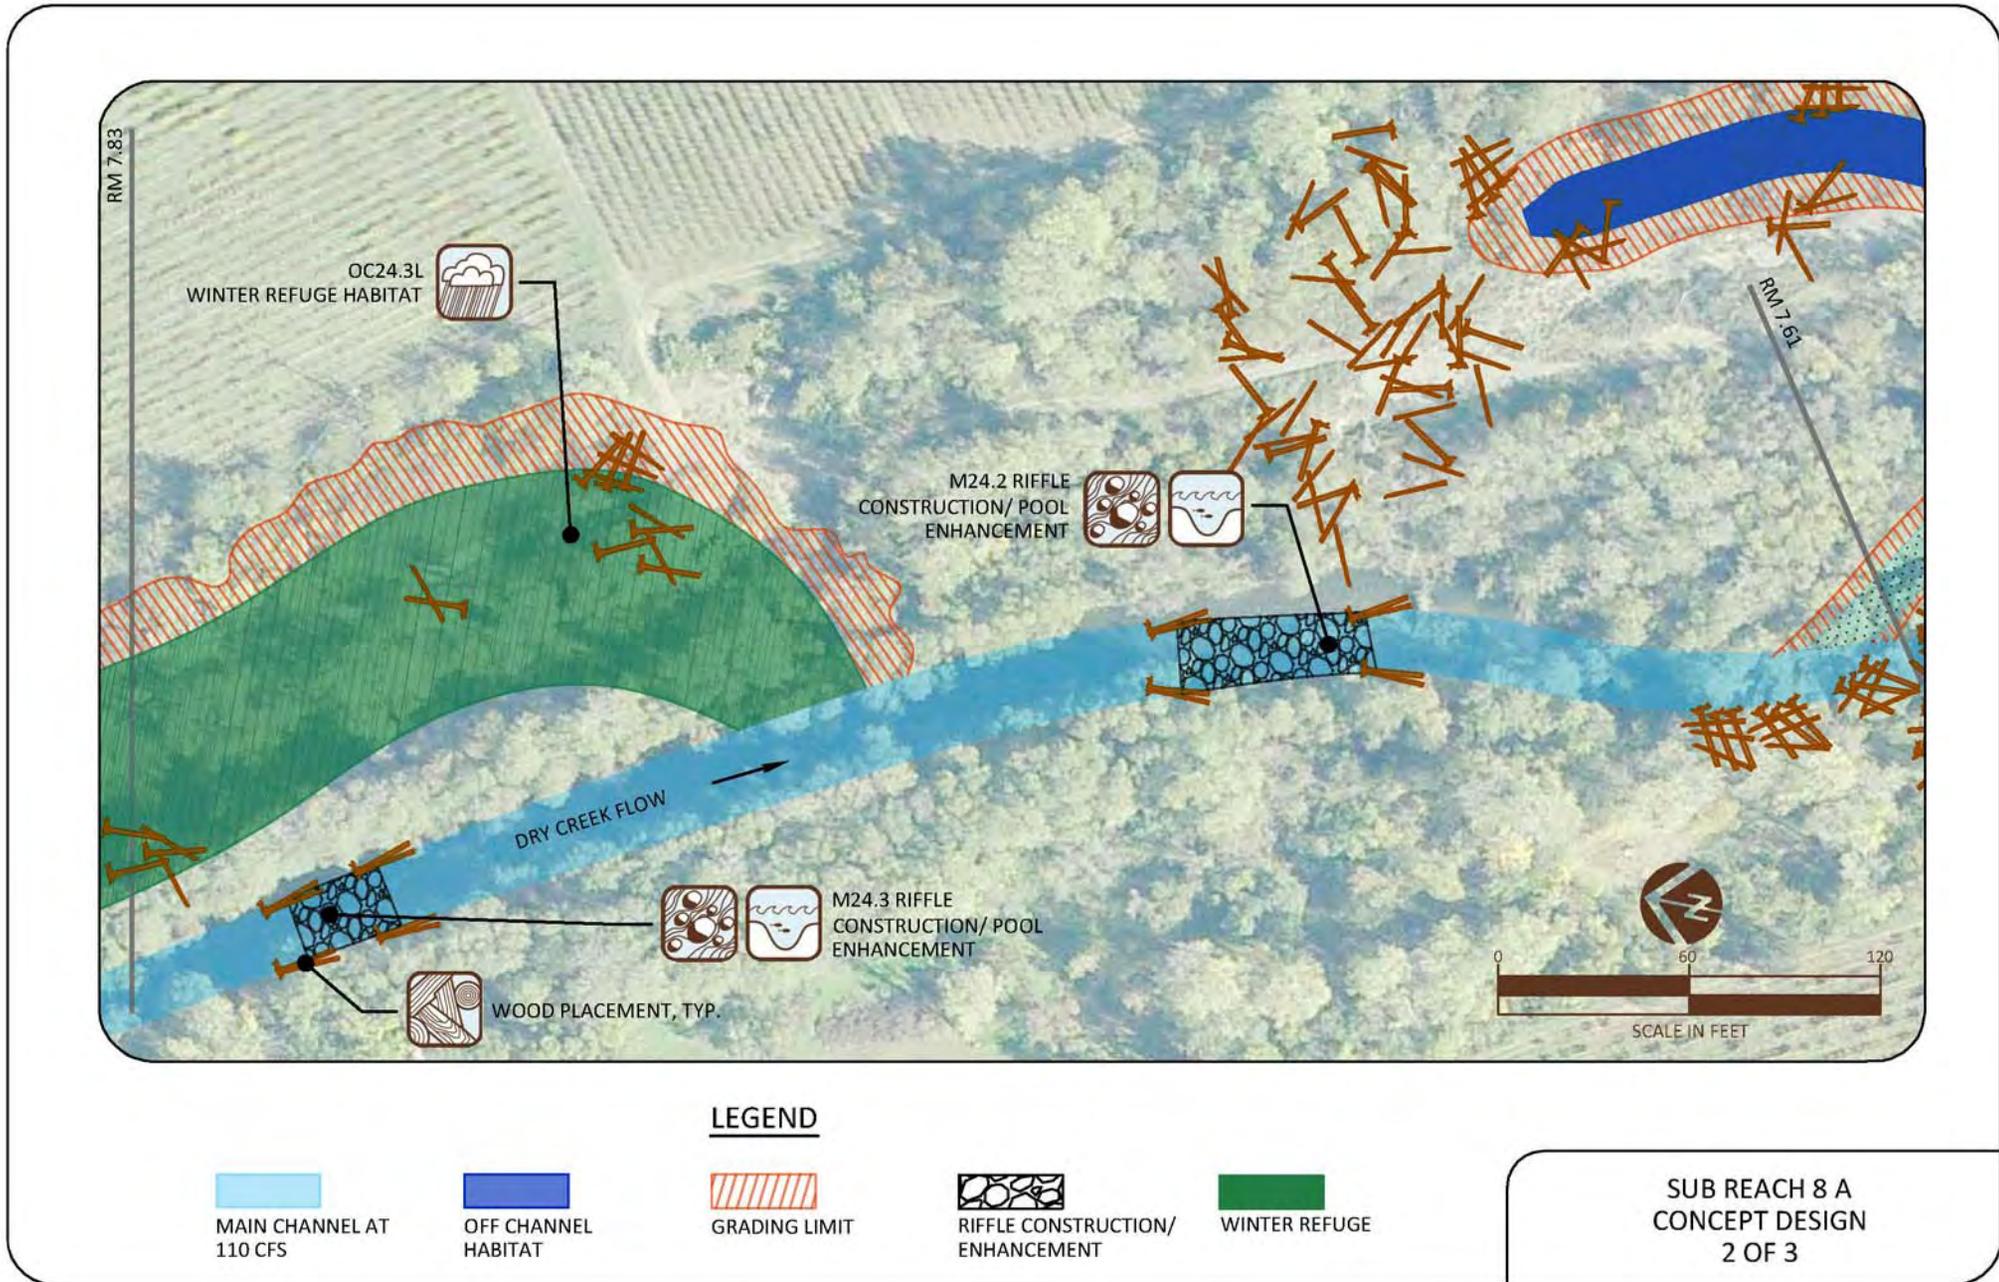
Sub-reach 8a conceptual design detail sheet 2 of 3.
